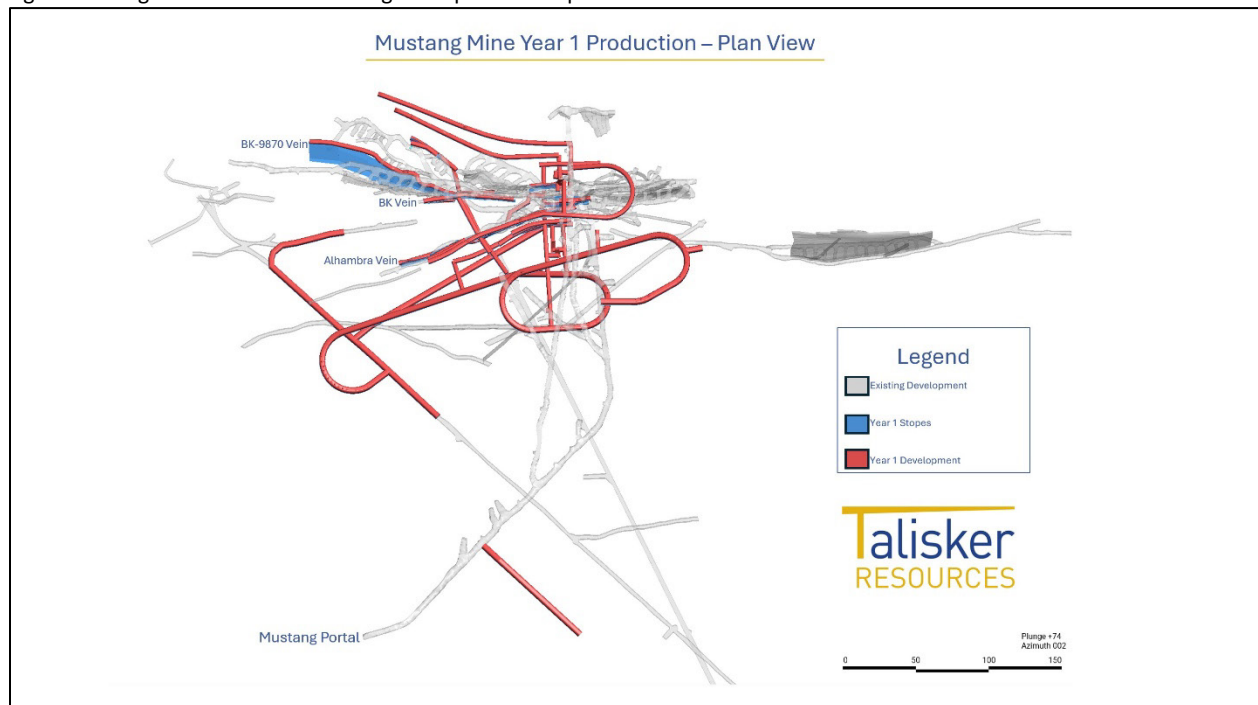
Plan view of Mustang Mine production plan between March 2025 and March 2026.
